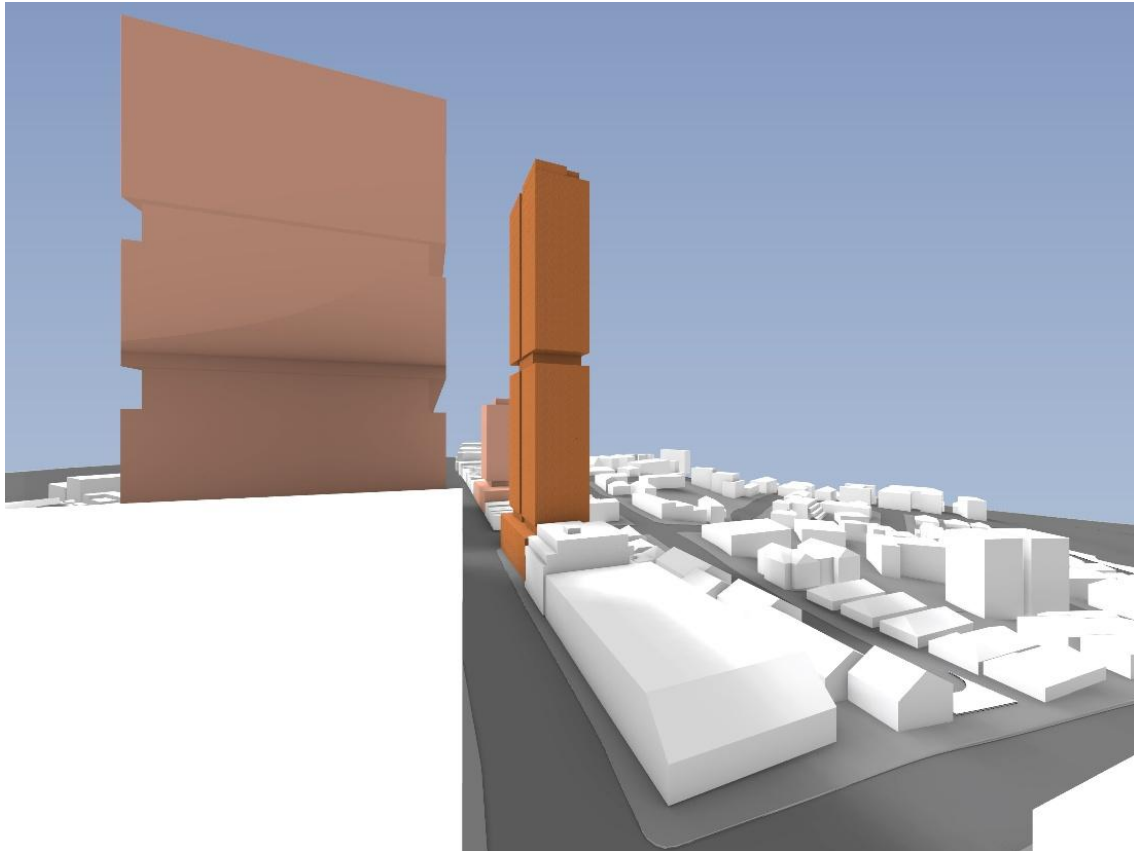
Southern elevation, fronting Pacific Highway - Level 16 (Source: COX Architecture)
